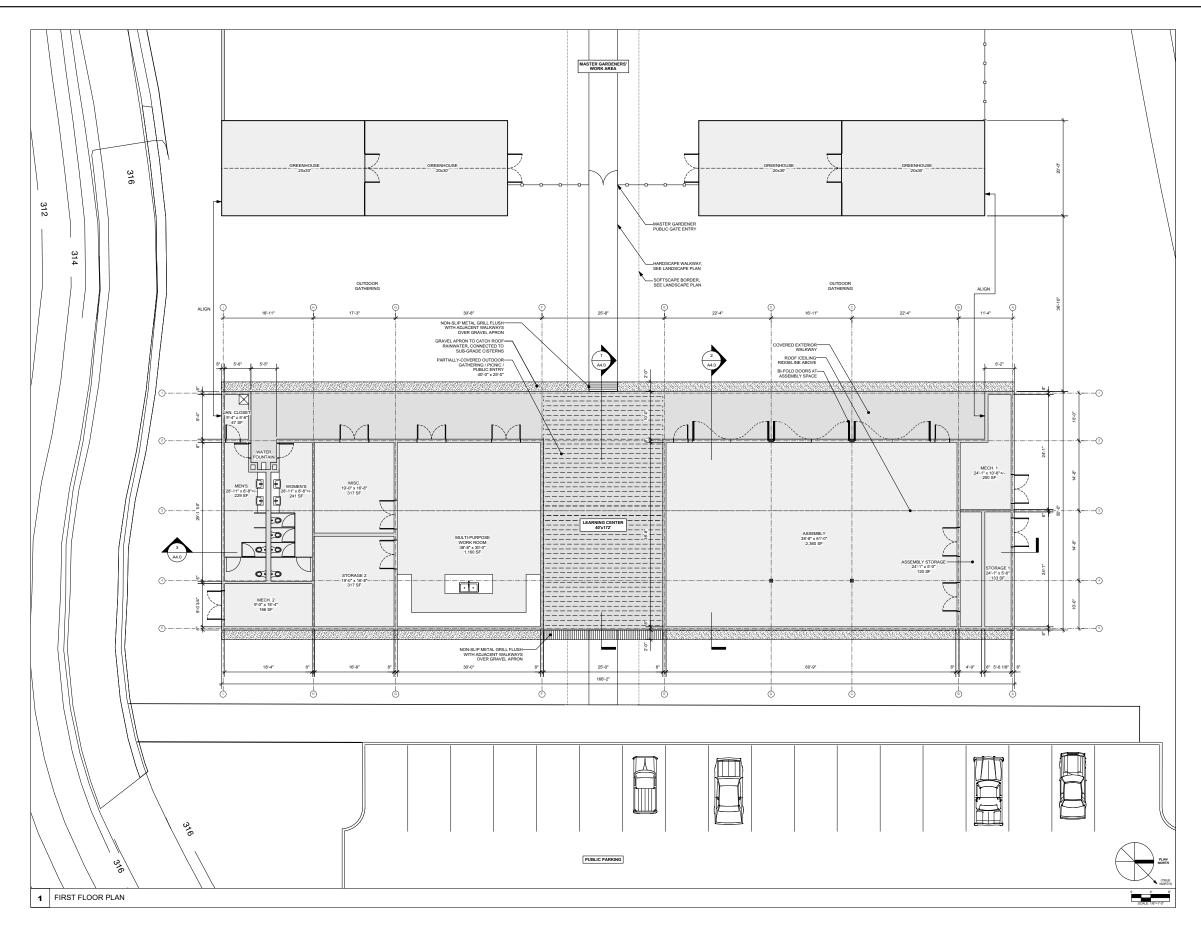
SUB-AREA 7 - ARCHITECTURAL FLOOR PLAN 2
